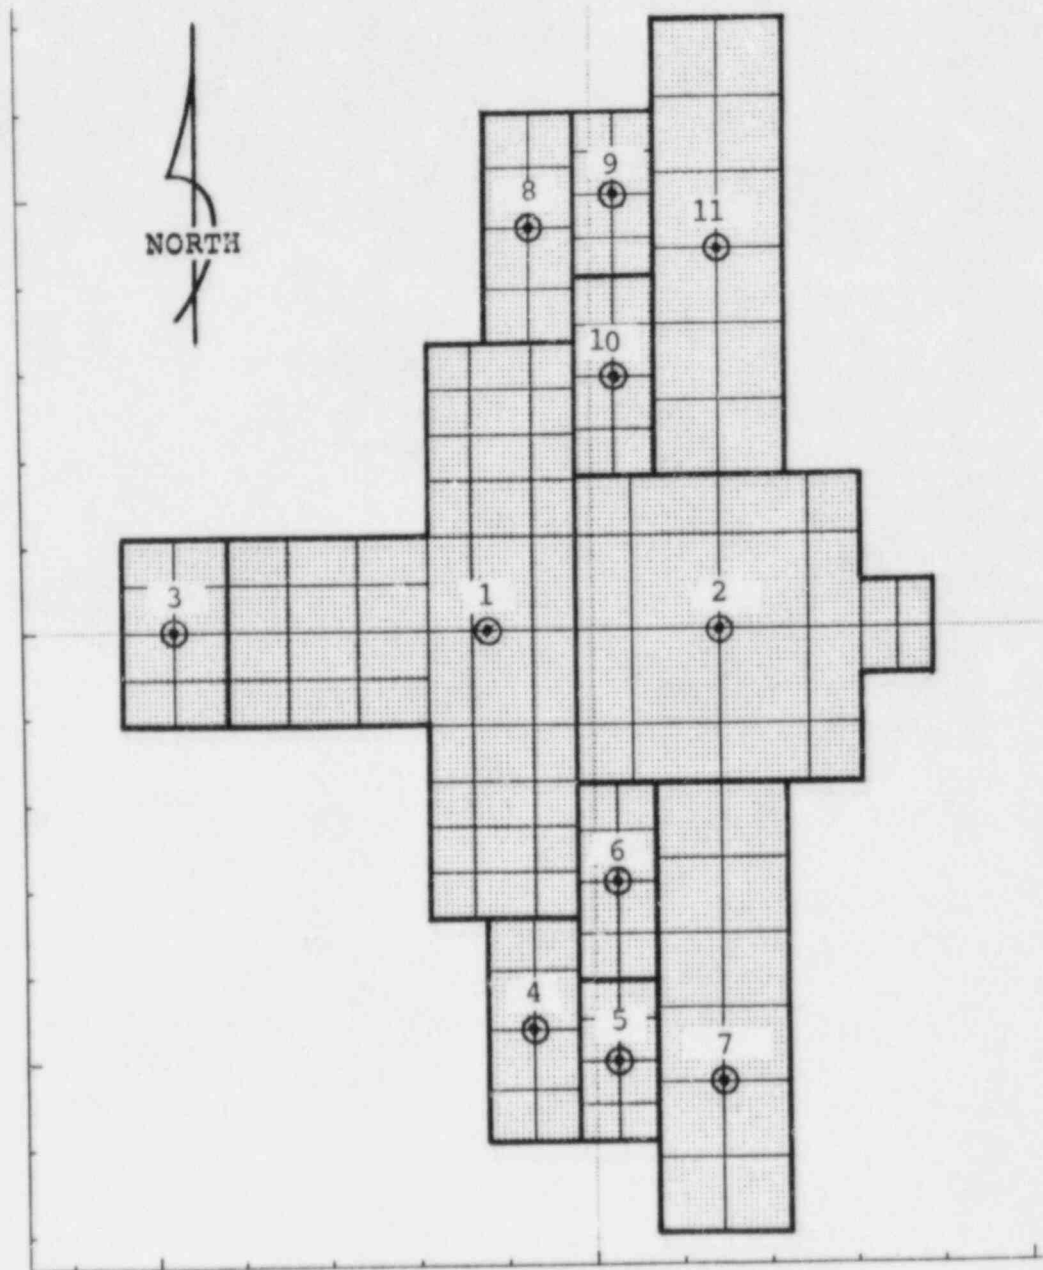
Plan view of the AFT complex surface-foundation model -- discretization for eleven rigid segments.
